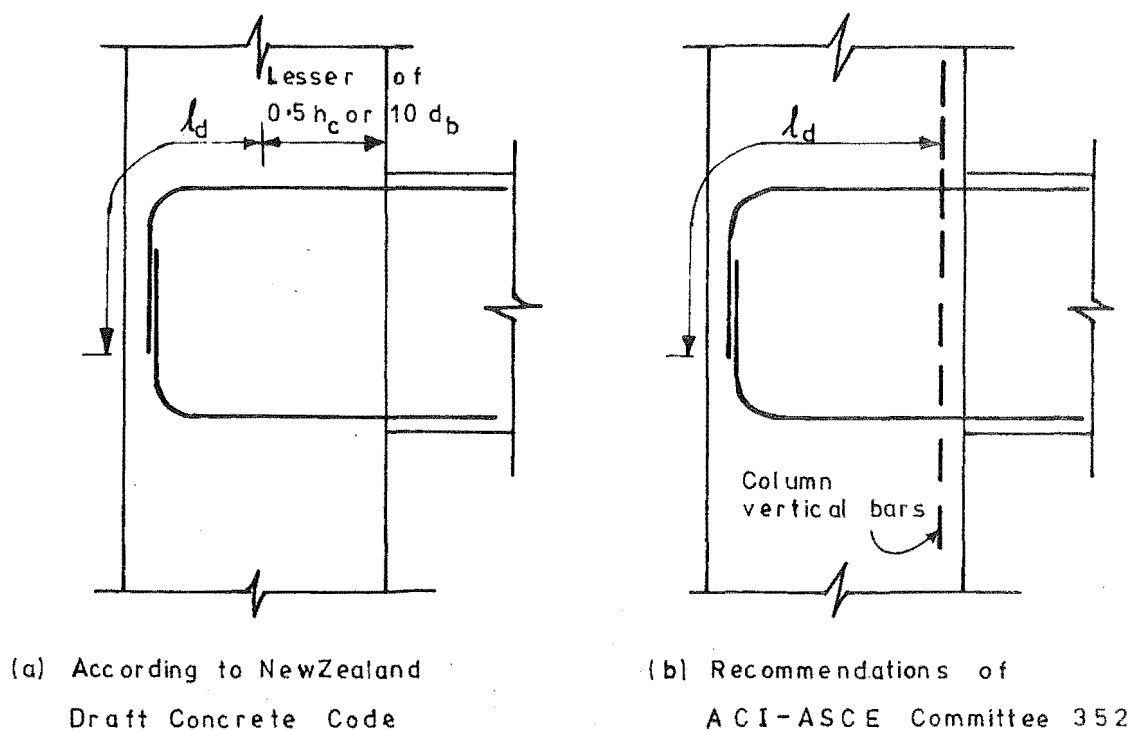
RECOMMENDATIONS FOR ANCHORAGE OF BEAM FLEXURAL BARS AT EXTERIOR JOINTS
